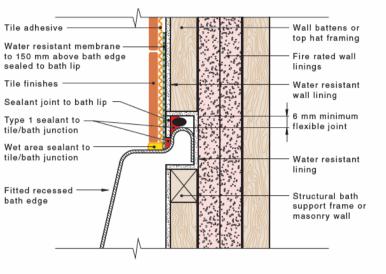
(E) — Bath with no shower over it — Fitted bath — Fire rated framed wall
